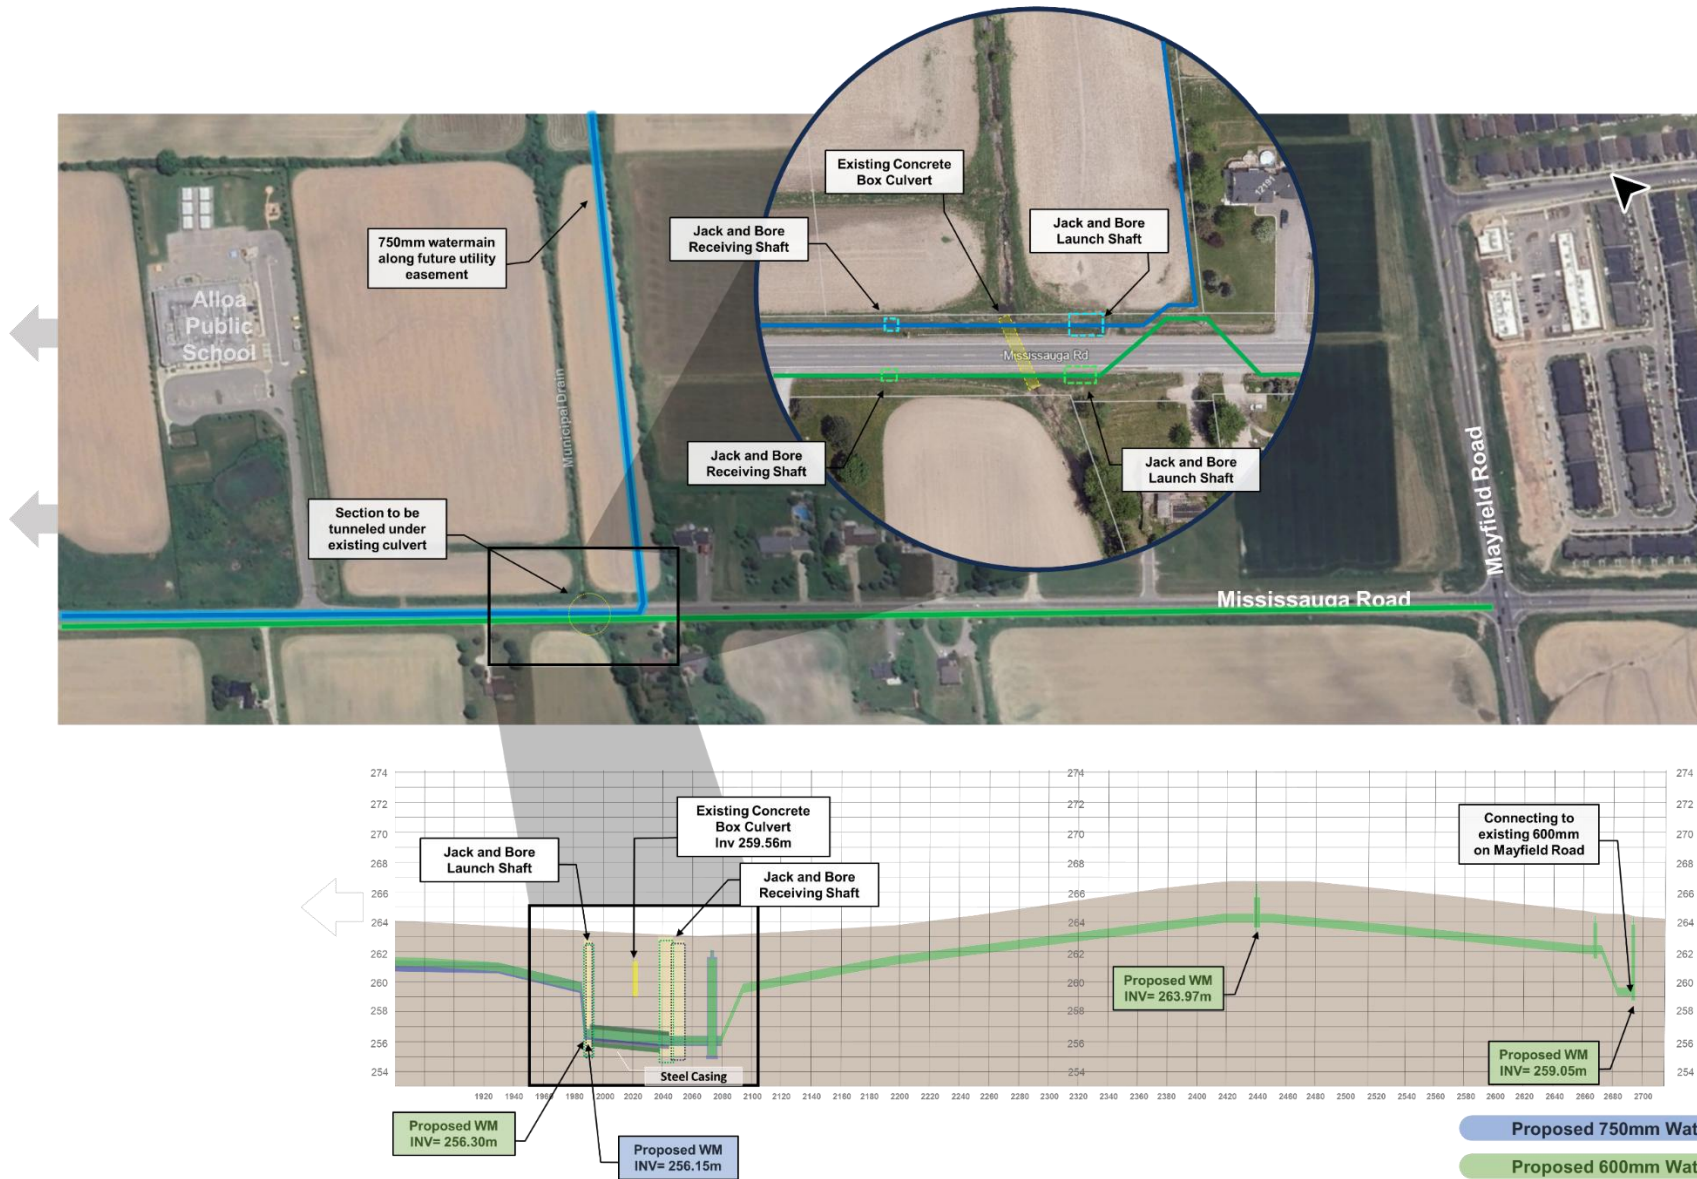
Mississauga Road Alignment Plan and Profile (2/2)
